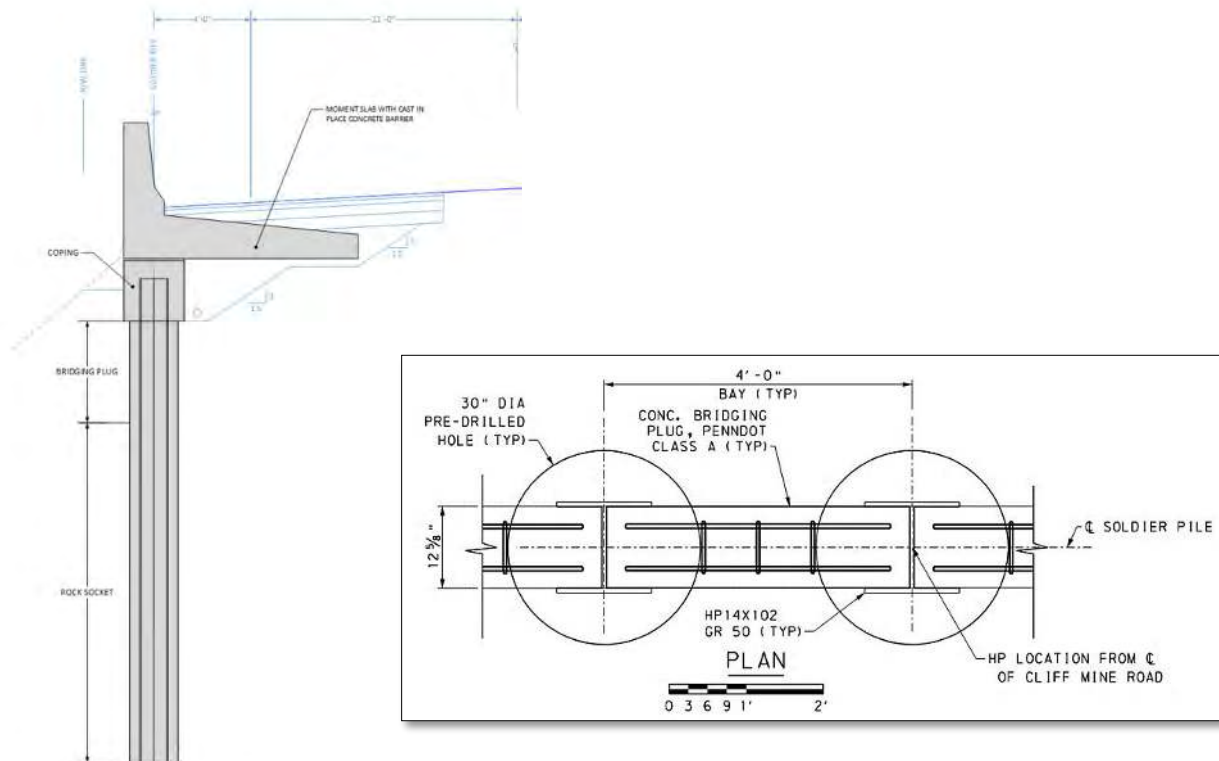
Typical Section (left) and Plan View (Right) – Buried Soldier Pile Wall with Bridging Plug
